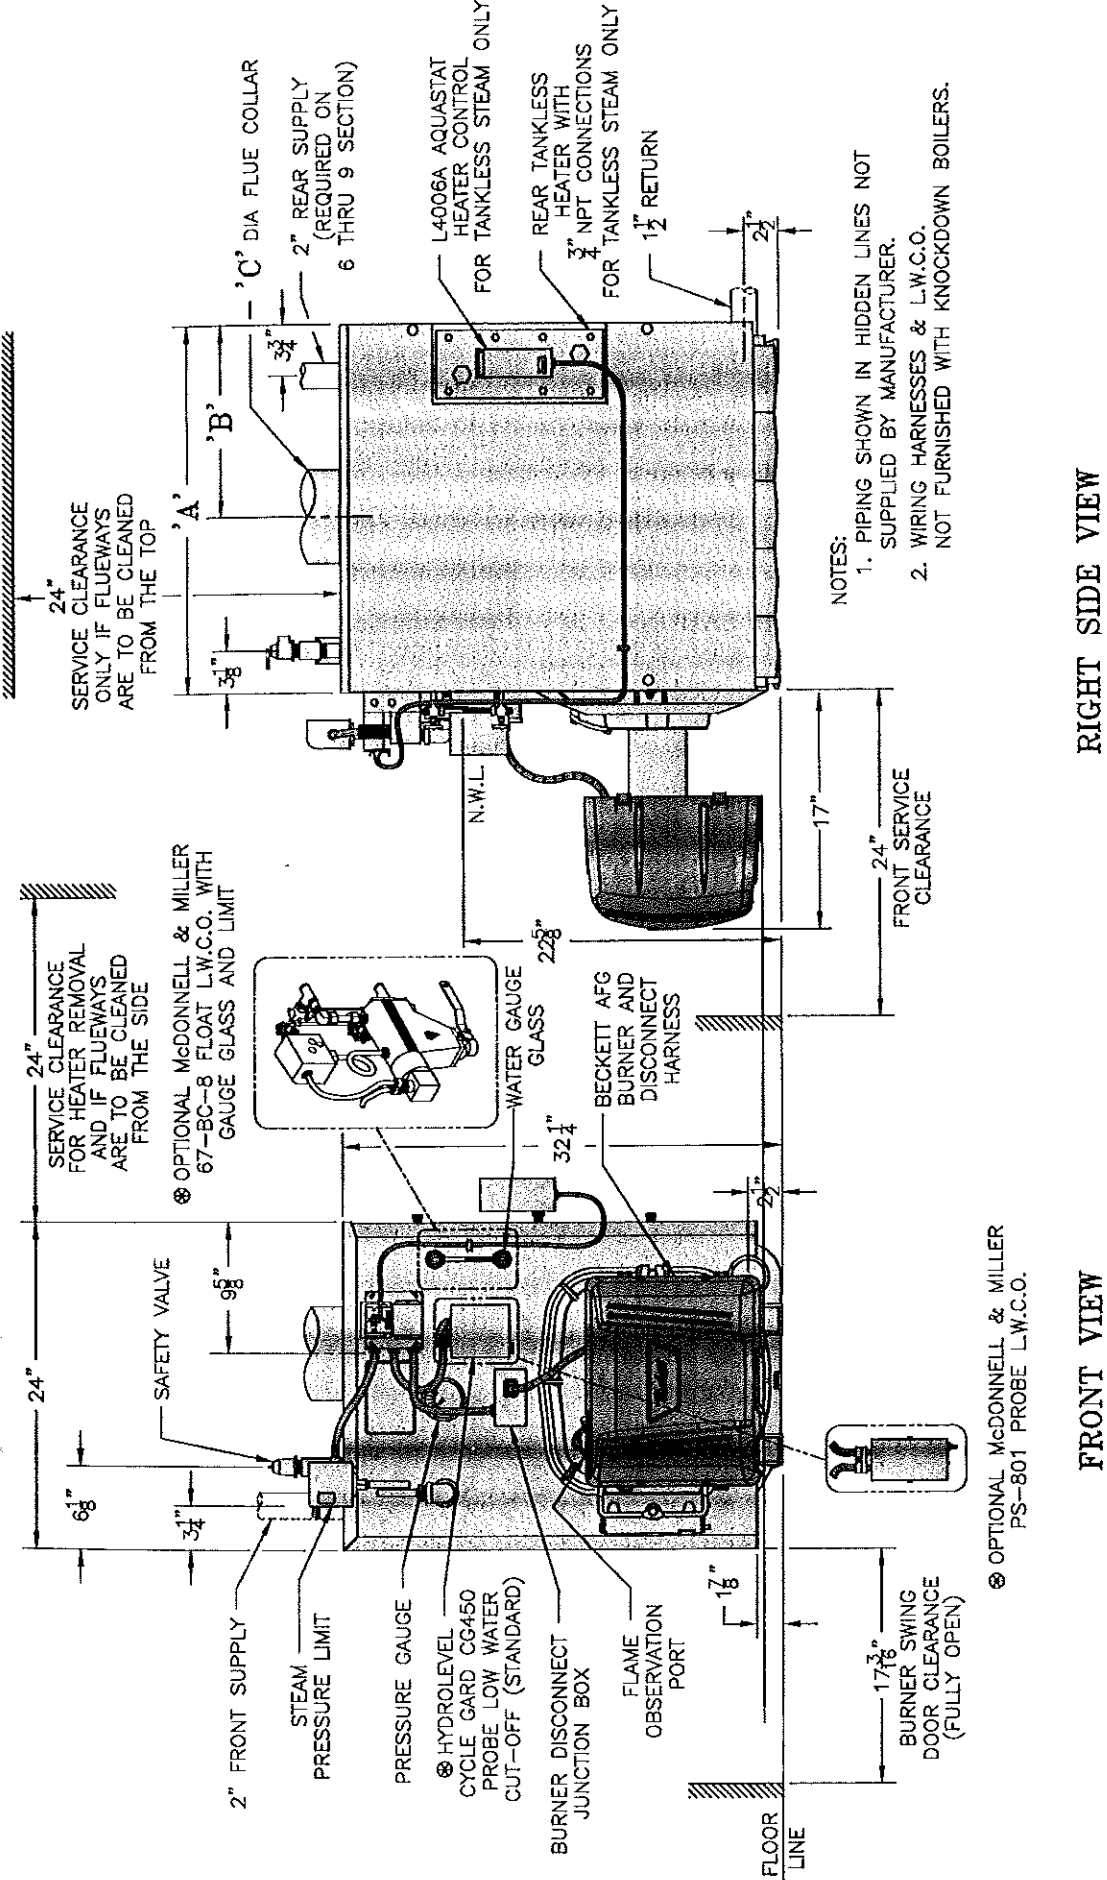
D: V8H3 thru V8H9 Steam Boiler with or without Tankless Heater
